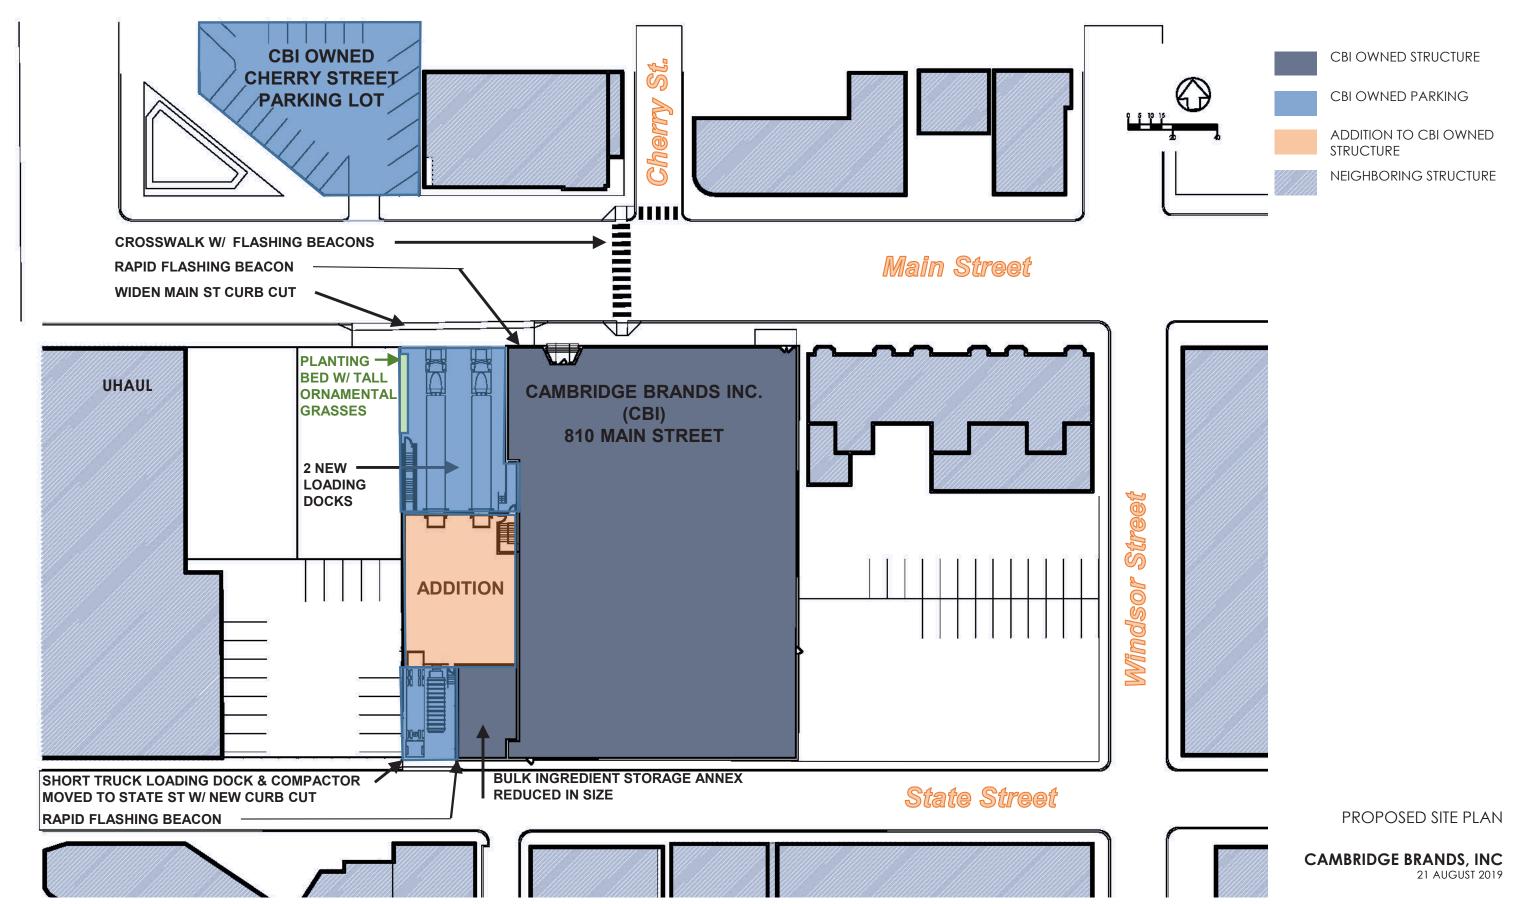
SITE PLAN: PARKING ANALYSIS
